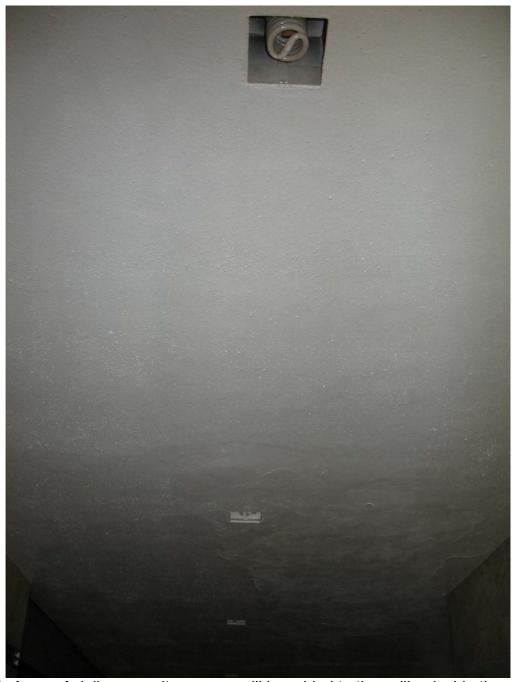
A new Avigilon security camera will be added to the ceiling inside the northwest Powerhouse door entrance.
